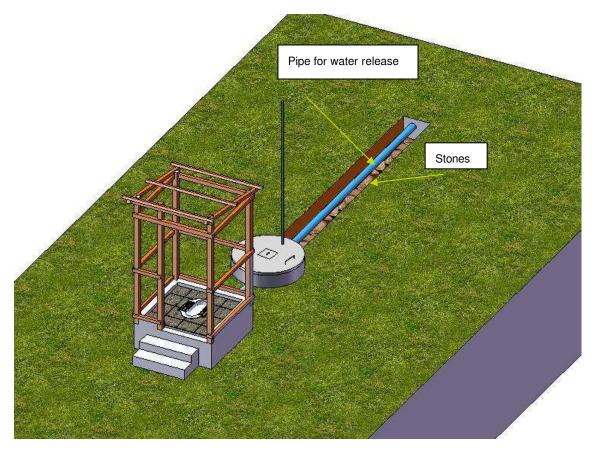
underground prolonged-pipe and grounded stone for seepage of water from the ring that reduces sludge full empty difficulty
